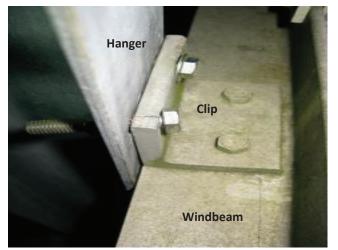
Crack in aluminum angle clip at windbeam to hanger connection
